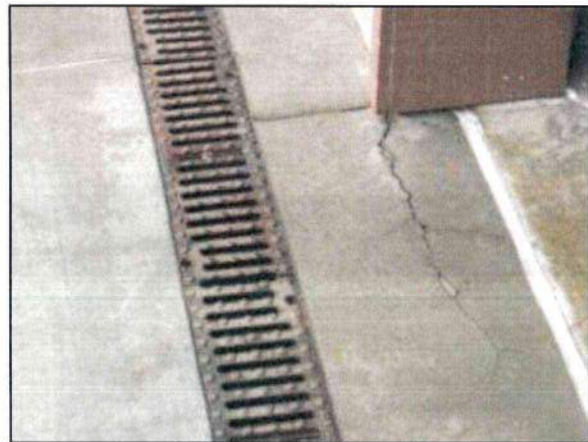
Fire Station #4 Cracked concrete is present in front of the right-side garage entrance. Cracks should be sealed to prevent additional damage.
